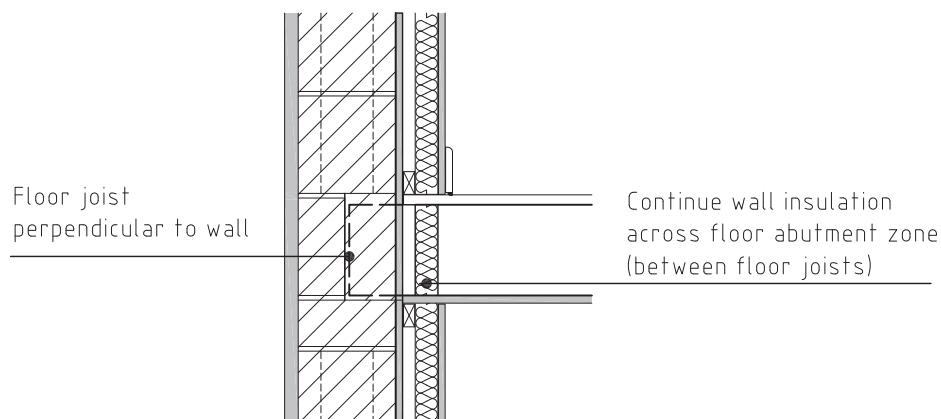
Timber intermediate floor - Joist perpendicular to wall
